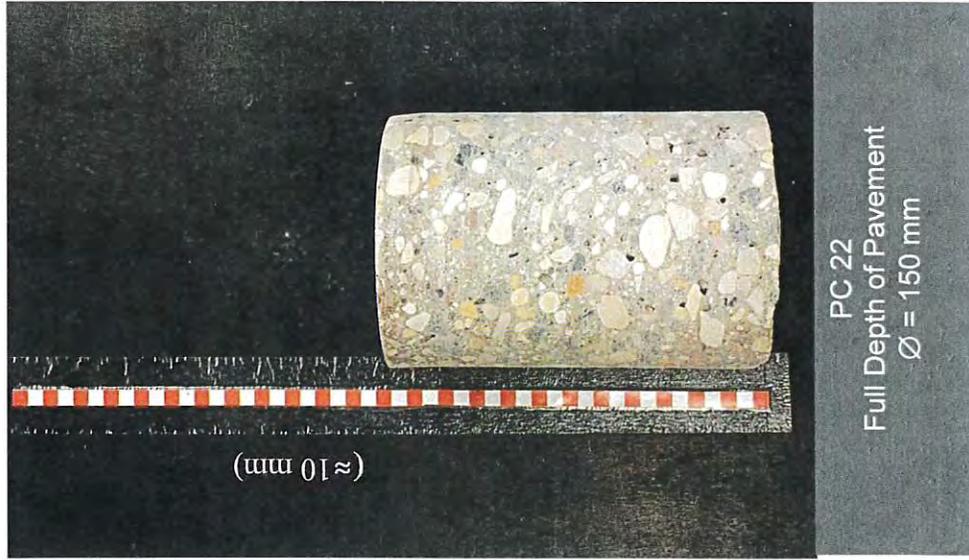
Specimen from Partridge Avenue, Eastbound South Curb Lane
